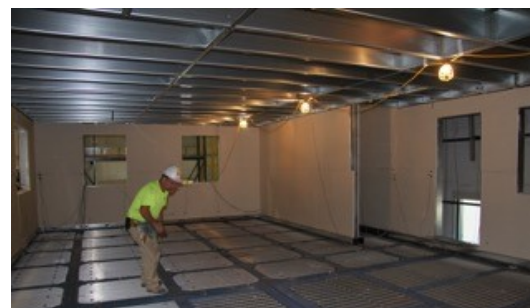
Gypsum sheathed walls (Peterman, 2014)
